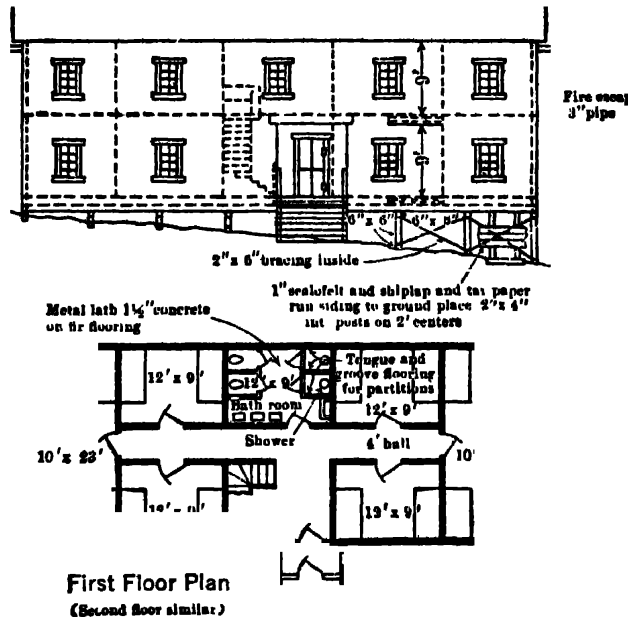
Two-story Bunk House, Flin Flon, Manitoba (67)
